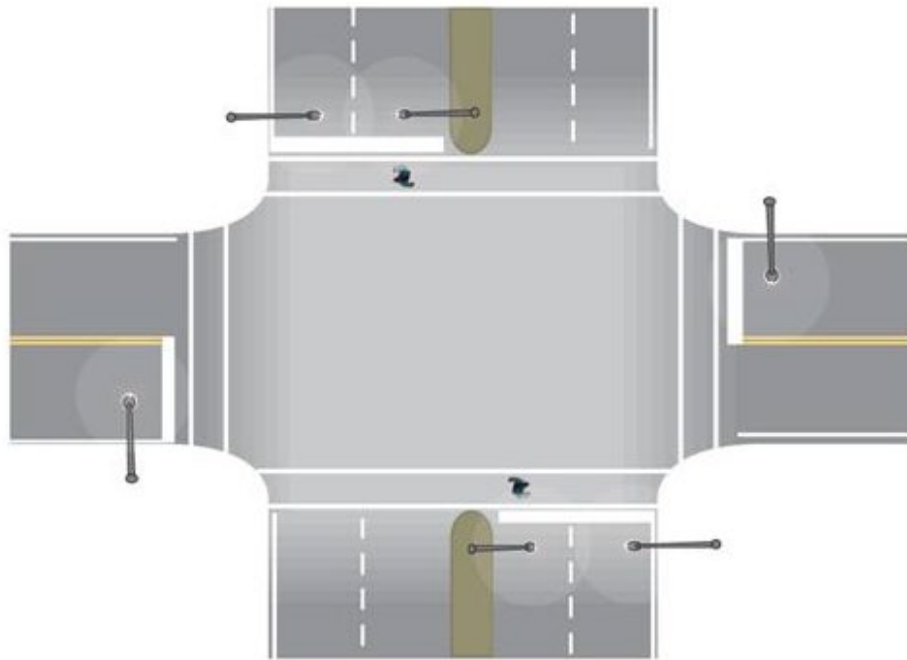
Graphic. Potential lighting layout for crosswalks at wide intersection approaches. Source: FHWA.
